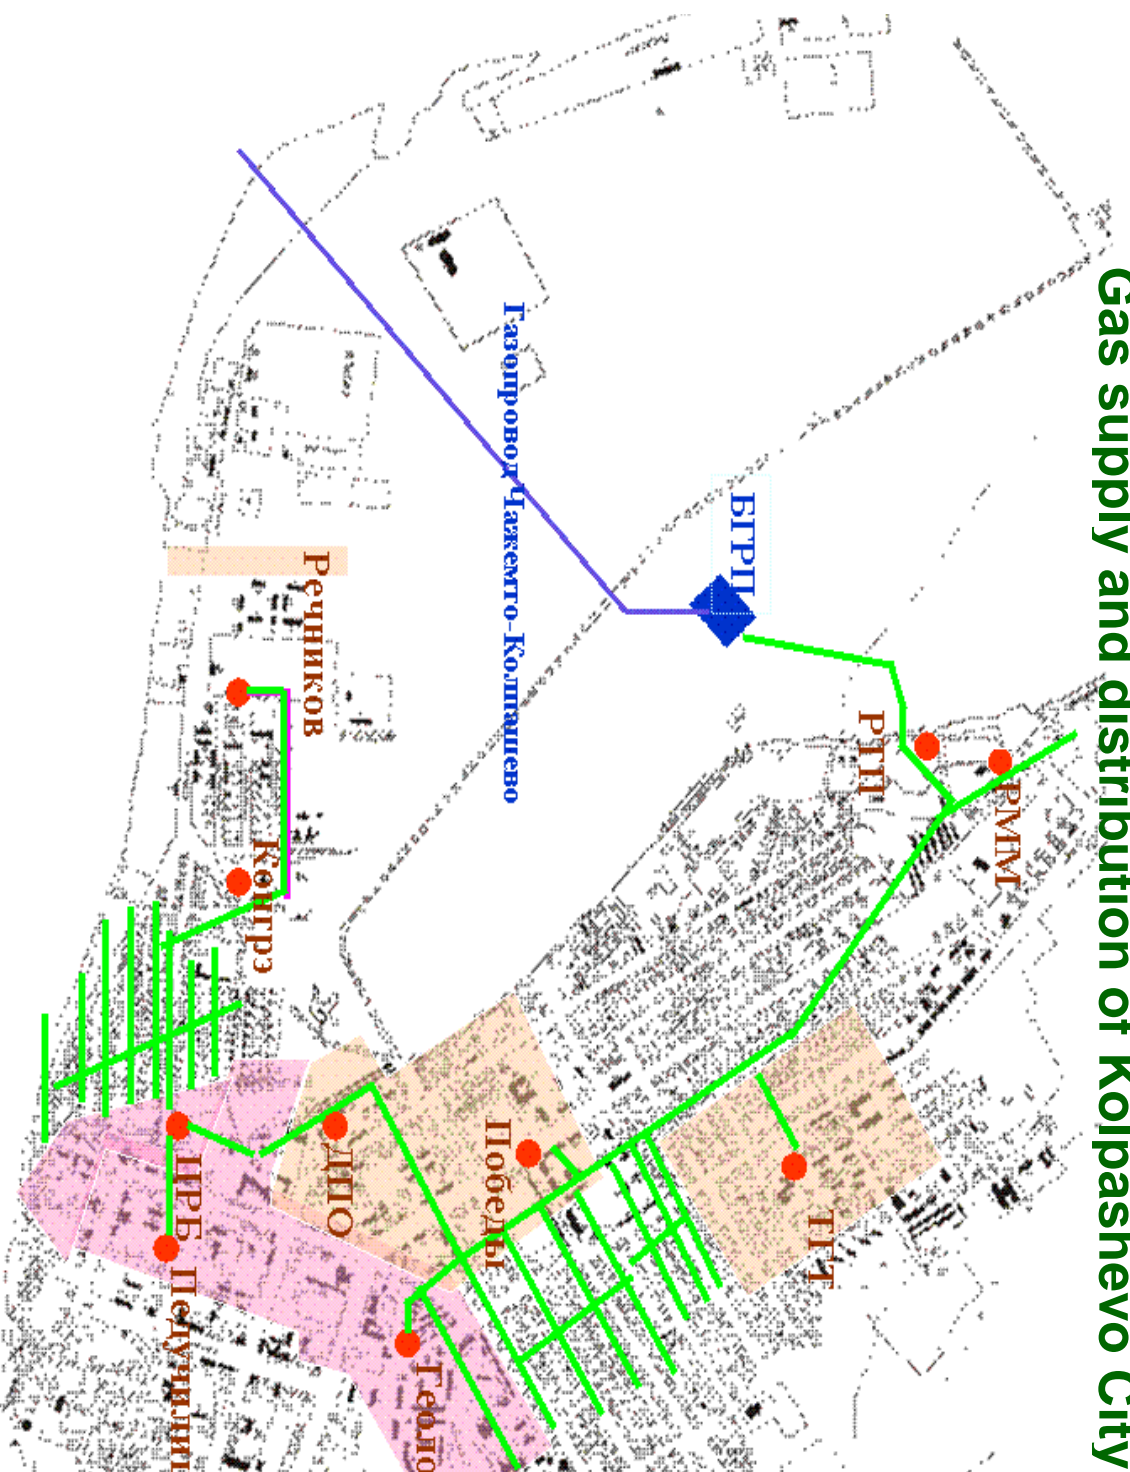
General Layout Plan of Gas Modules in the Kolpashchevo City
